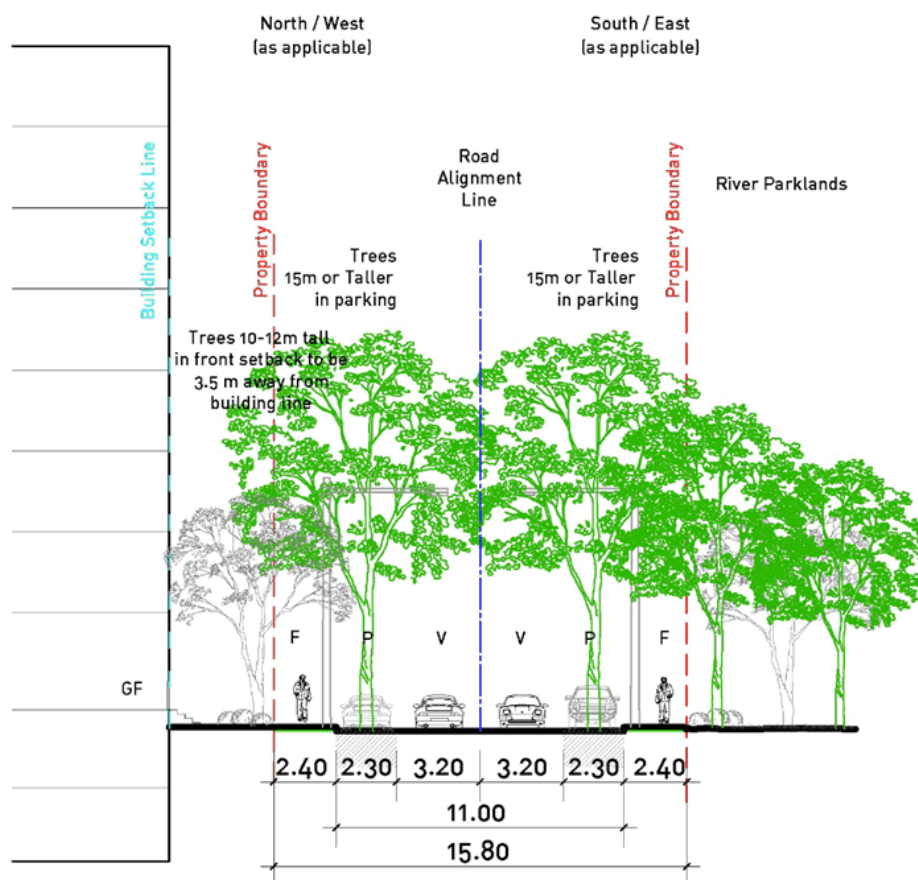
Type 5A Local Street (NSR 5)
